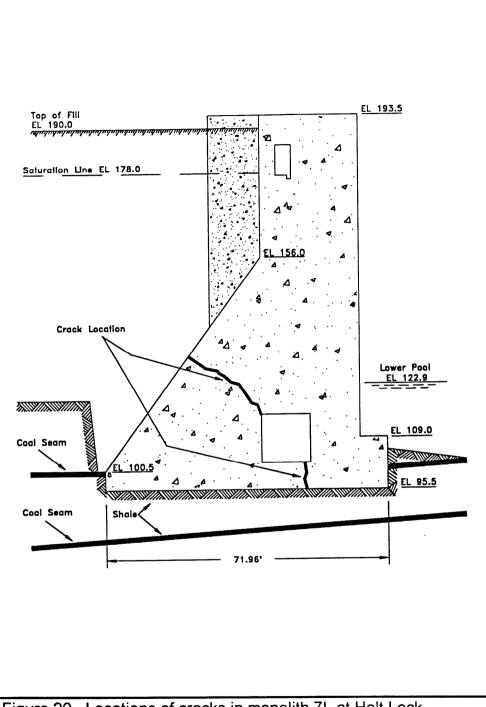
Locations of cracks in monolith 7L at Holt Lock
